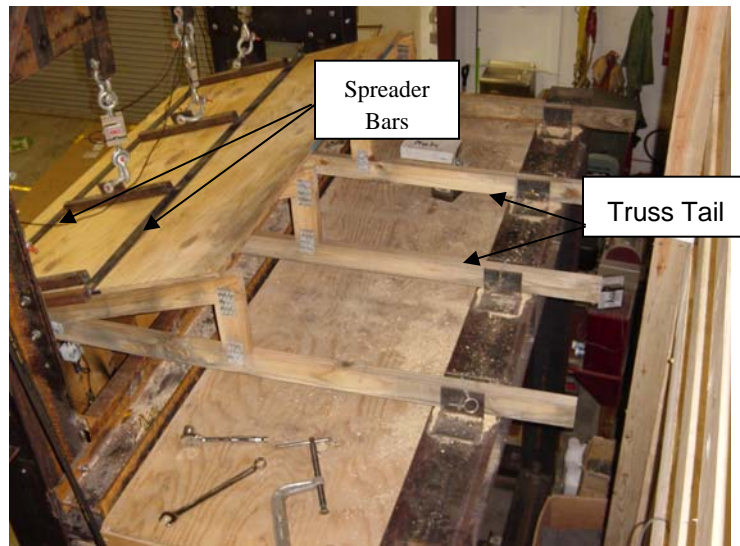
Spreader Bars for Applying Shear Loads to Sheathing and Rafter Tail Anchorage to Resist Out of Plane Loading from Air Bags.
